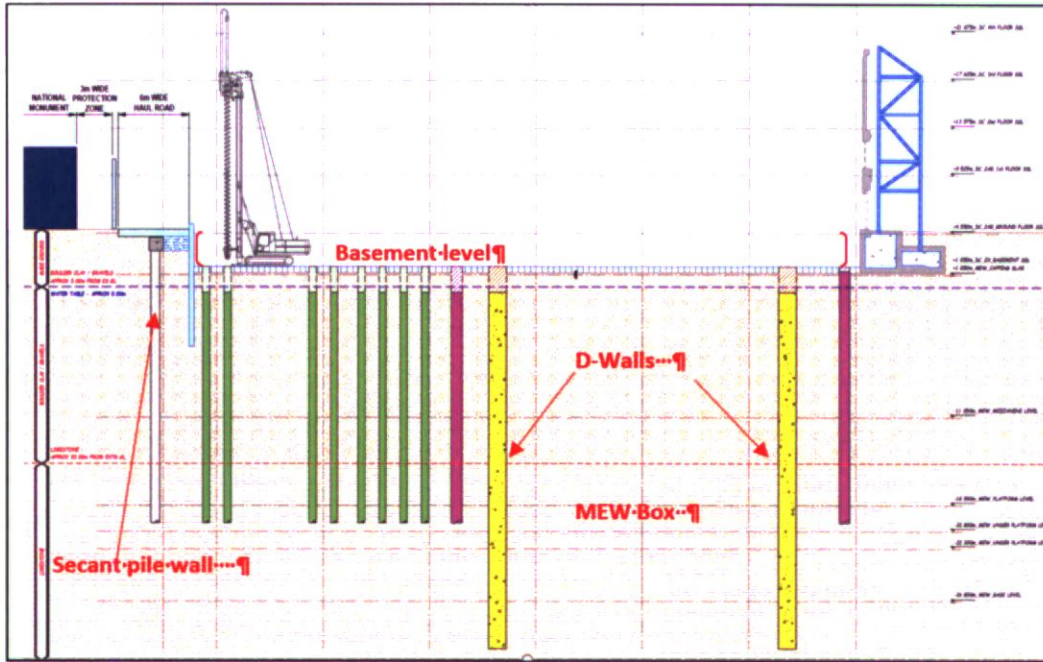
Cross section showing excavation to piling mat level before the bulk excavation of the MEW. A 3m wide protection zone will be established to the rear of the National Monument.
